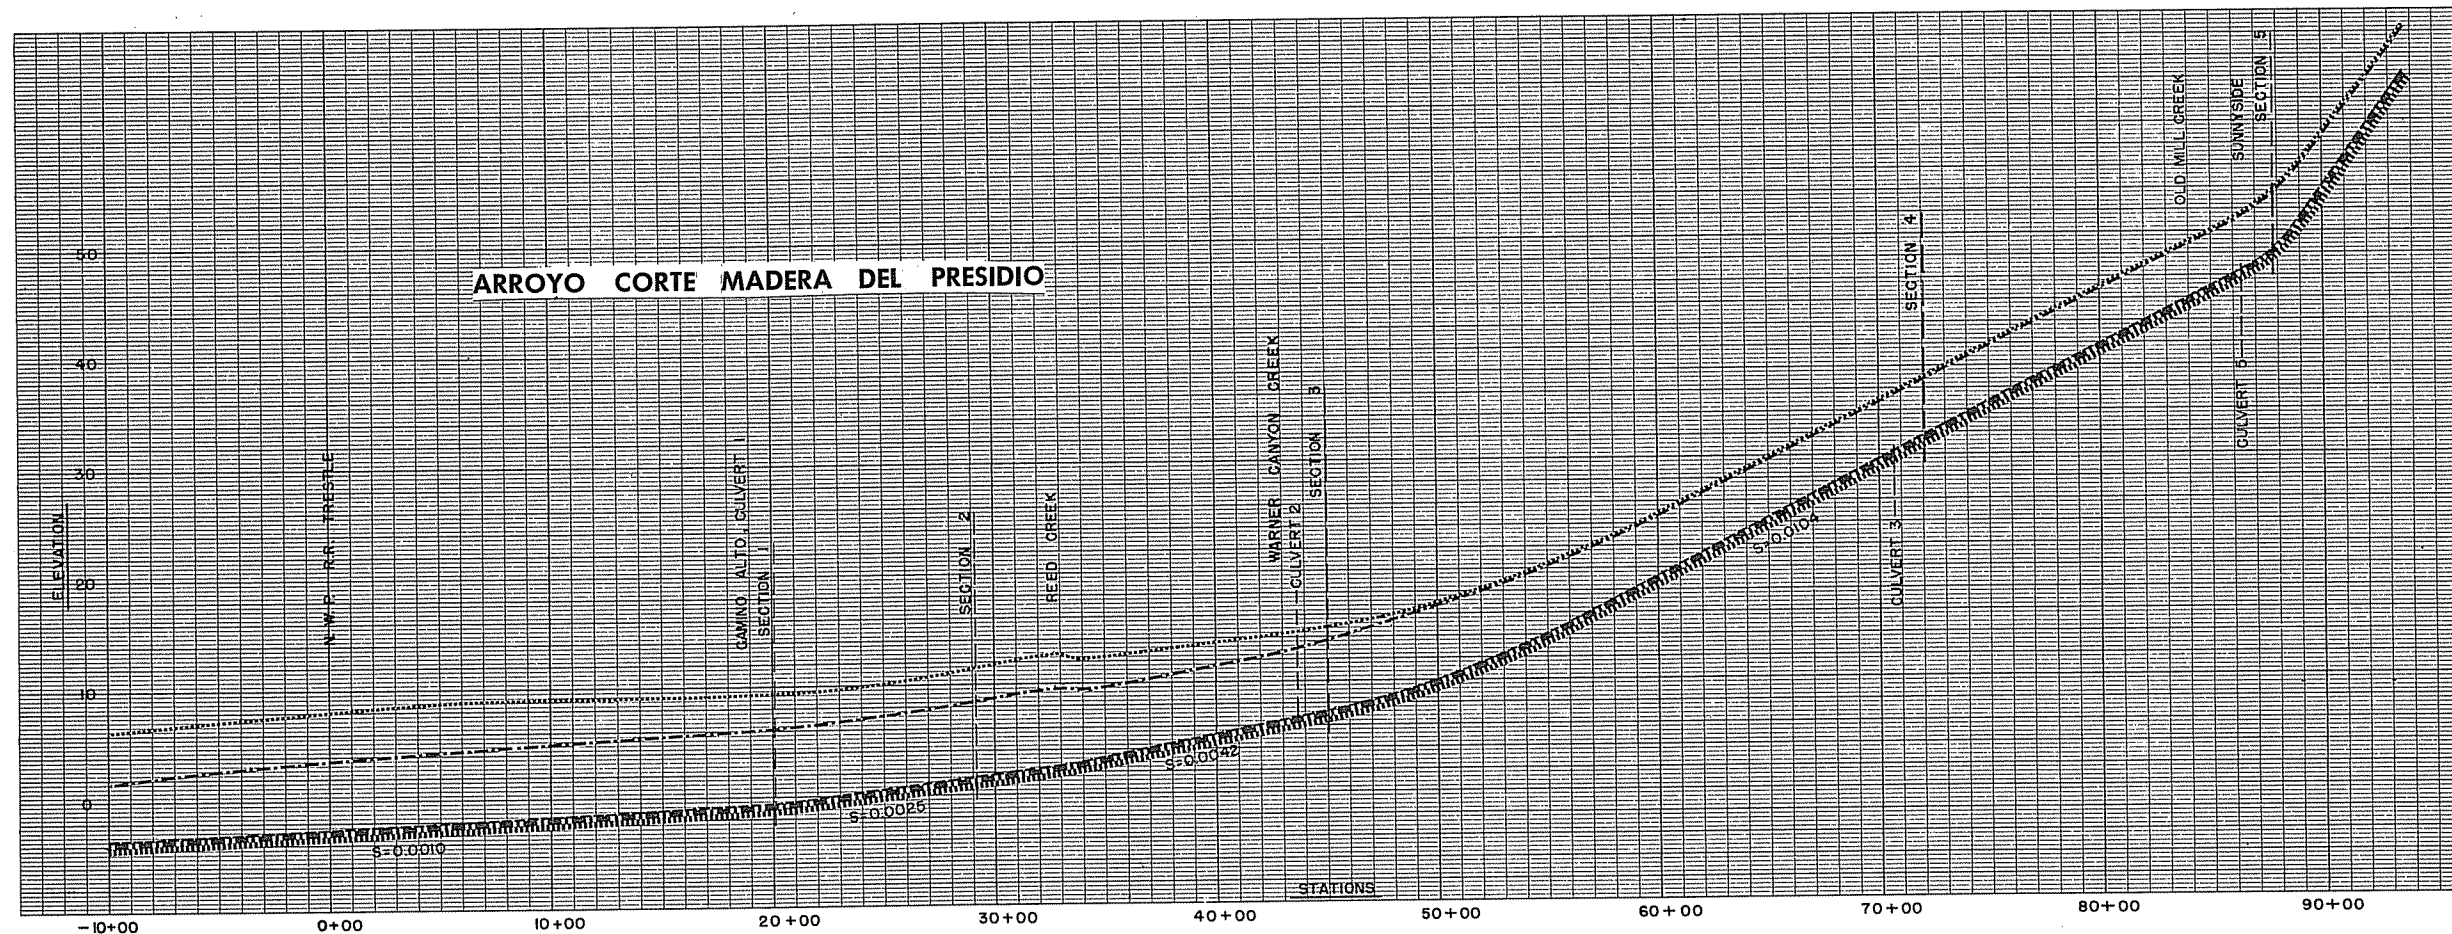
shows existing stream profiles and cross sections together with recommended modifications for Arroyo Corte Madera del Presidio. Where no modifications to the section are shown, modifications are not required.
